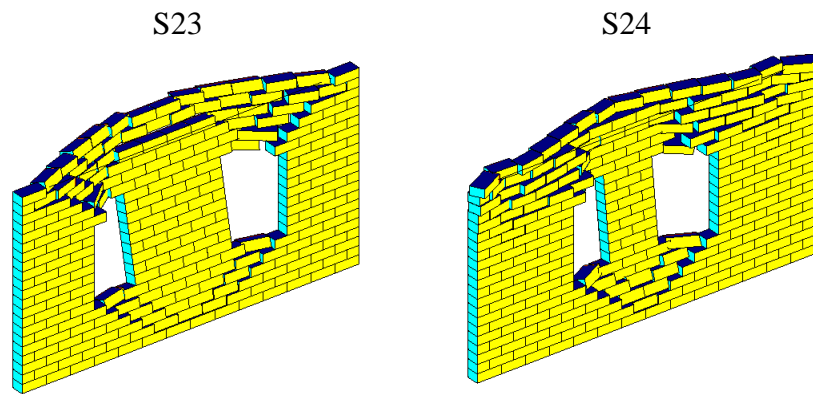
Failure mechanisms for two masonry panels with openings restrained along lateral columns considered by Restrepo Vélez et al. (2014) modelled with DEM.
